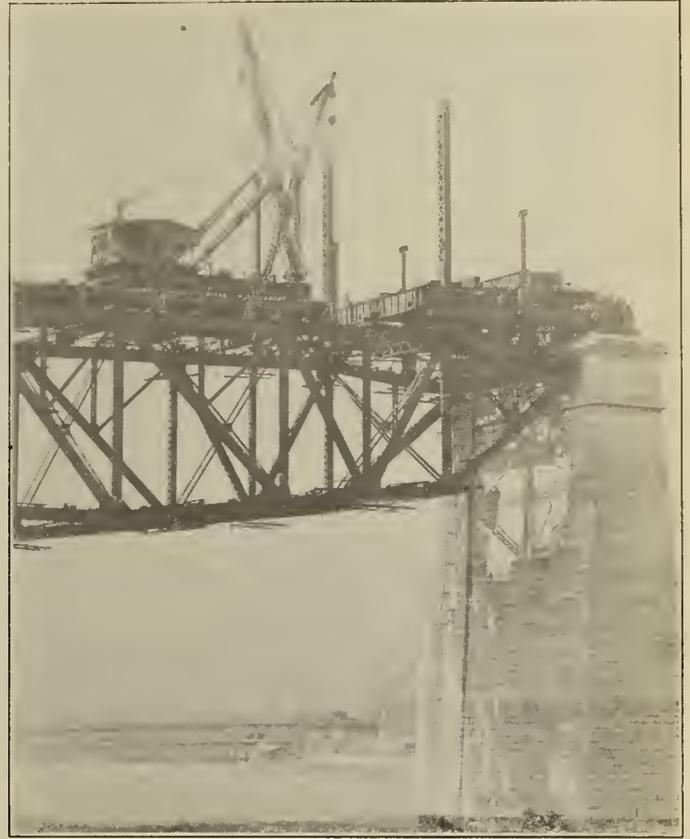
Main Span, South Side—Erecting Bottom Chords and Floor System of Anchor Arm—First Stage.
